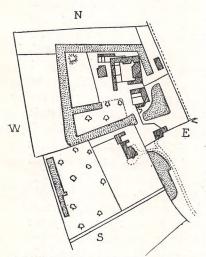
FIG. VII.-PLAN OF MOAT, BUILDINGS, ETC., AT ROOKWOOD HALL.
